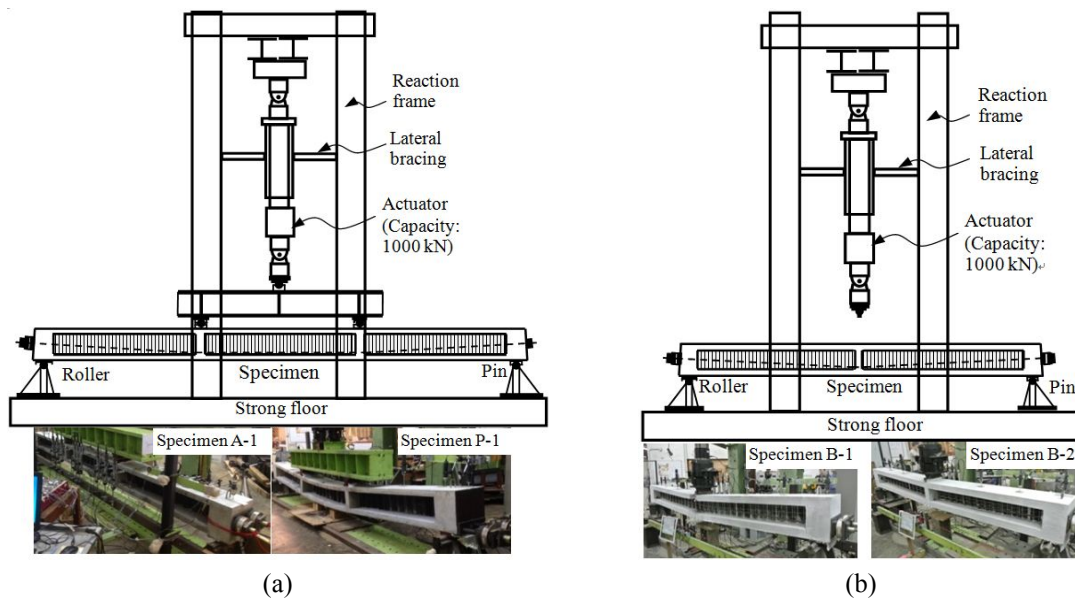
Test setup of specimens tested: (a) Specimens A-1 and P-1; and (b) Specimens B-1 and B-2
